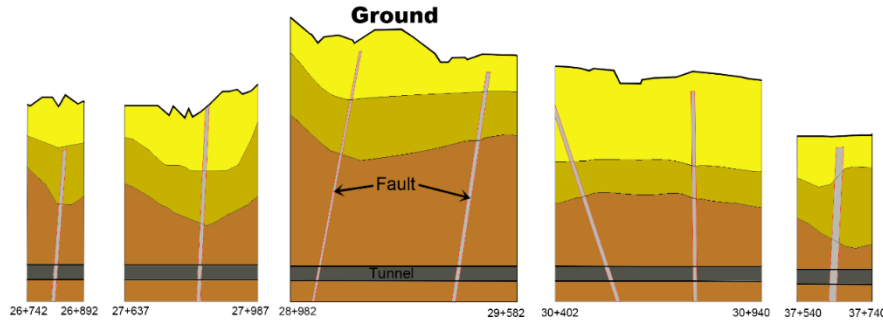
Longitudinal section of the tunnel section to be evaluated
